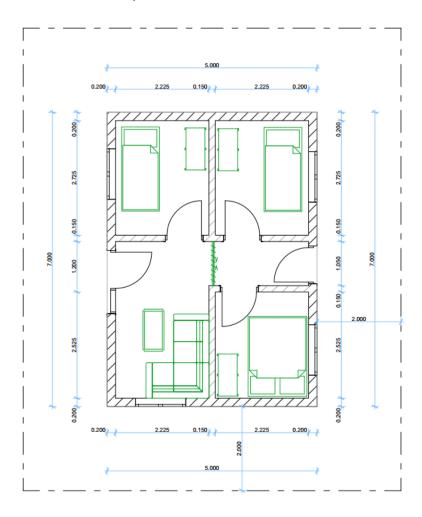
3. Proposed house floor plan in a plot/parcel of 7.5x20m
